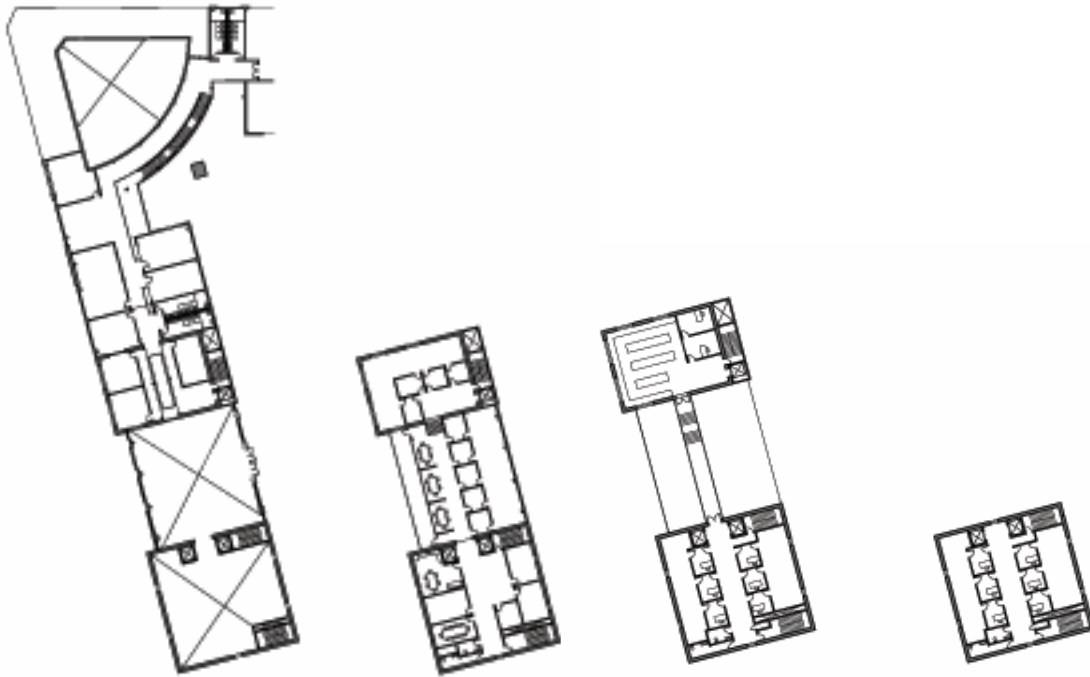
Mezzanine, 2nd floor, third floor and fourth floor plans
